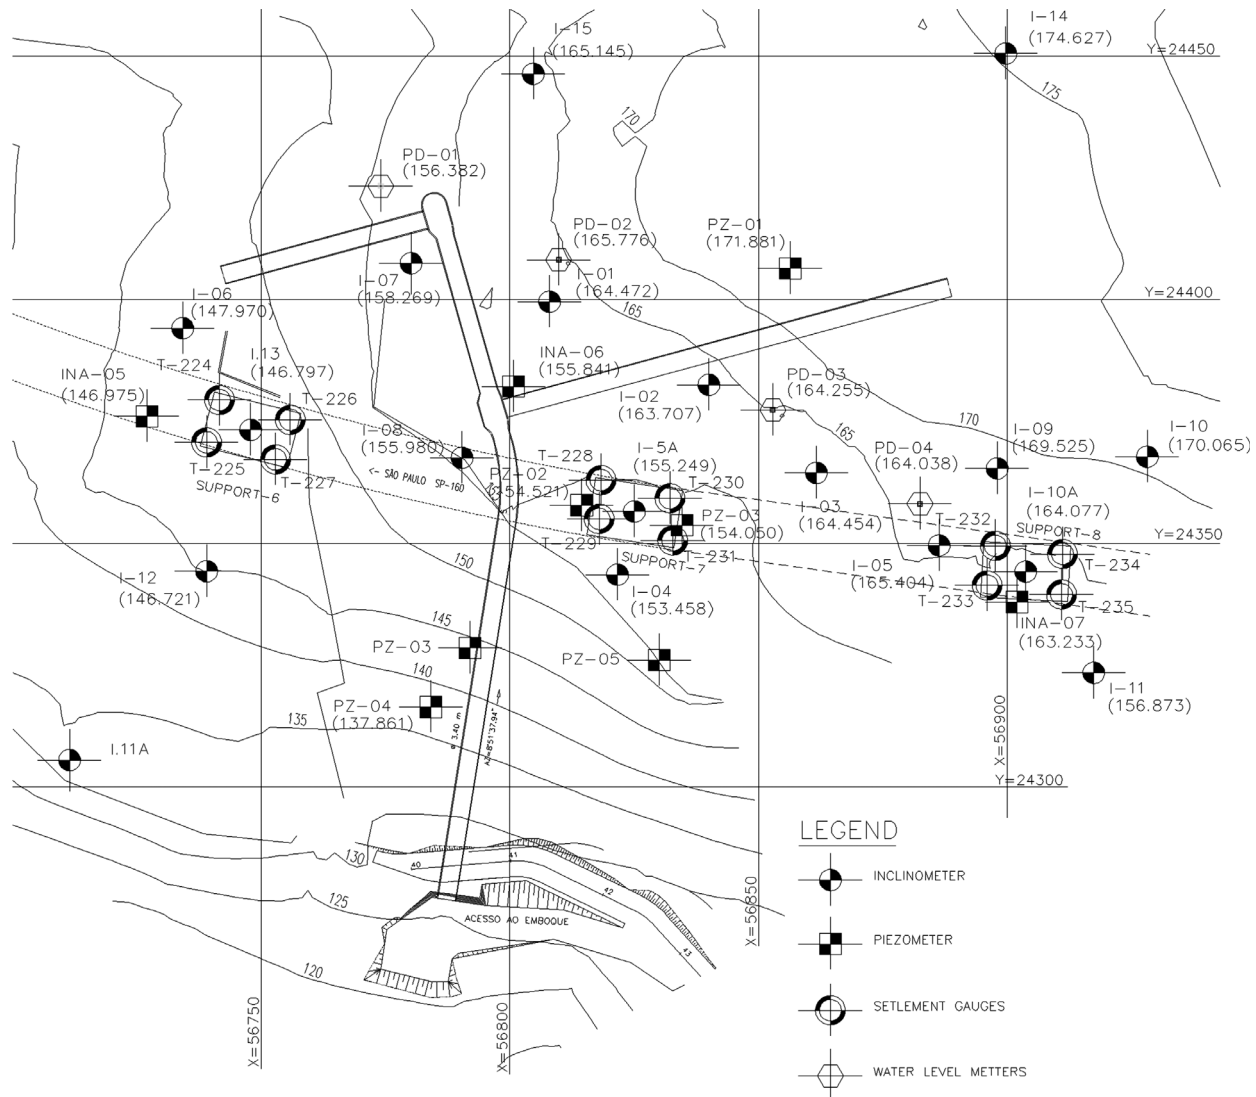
Plan view of tunnel, foundation of 3 pillars and monitoring instruments.
